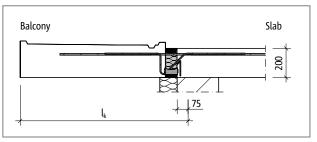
Schöck Isokorb® T type K-E, K-T: Static system, cross-section
